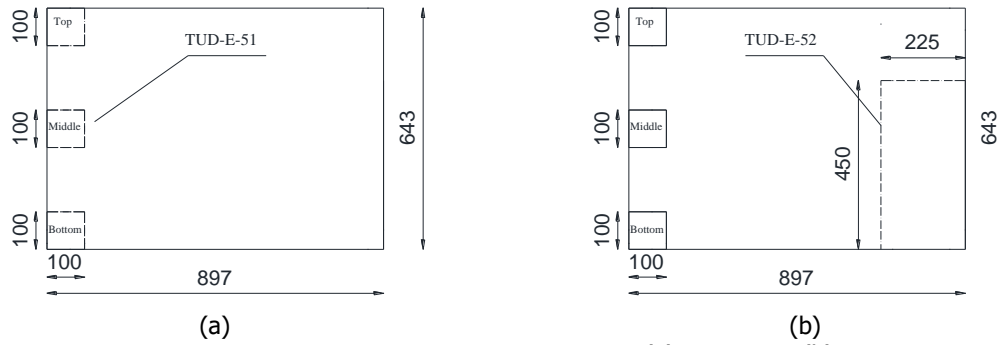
Compression test on sawn-cut specimens: (a) TUD-E-51; (b) TUD-E-52.
